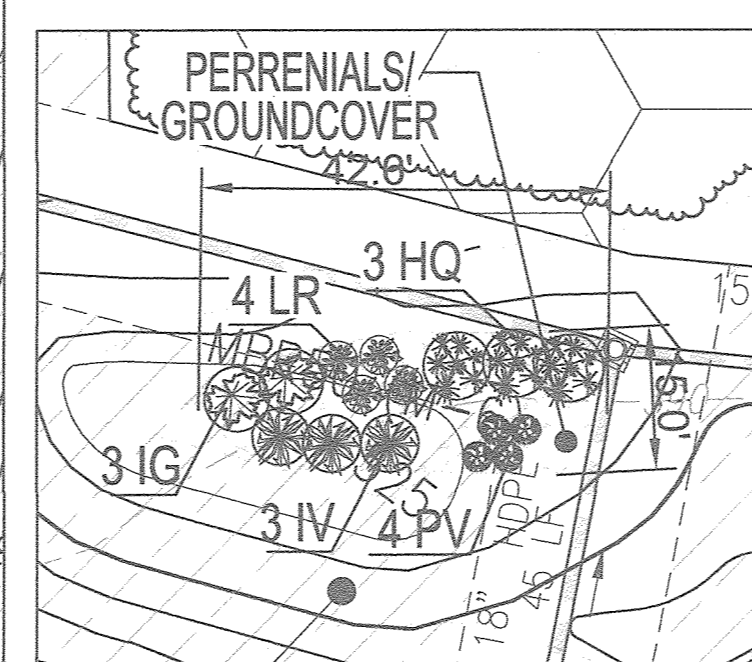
DETAILED BIO AND PLANTING PLAN (SWM #21)
